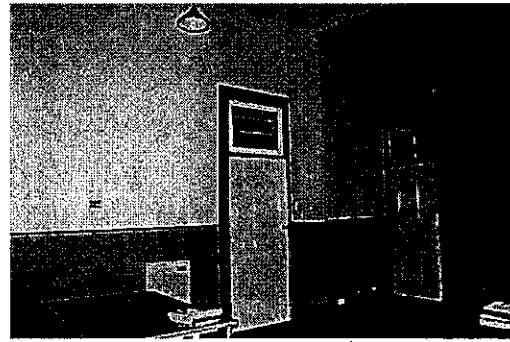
Interior, Office (spaces FF04-05). View looking south-east. Note projecting wall and ceiling nubs indicating the location of the previous original wall. Also note the original panellled timber doors with transoms.
